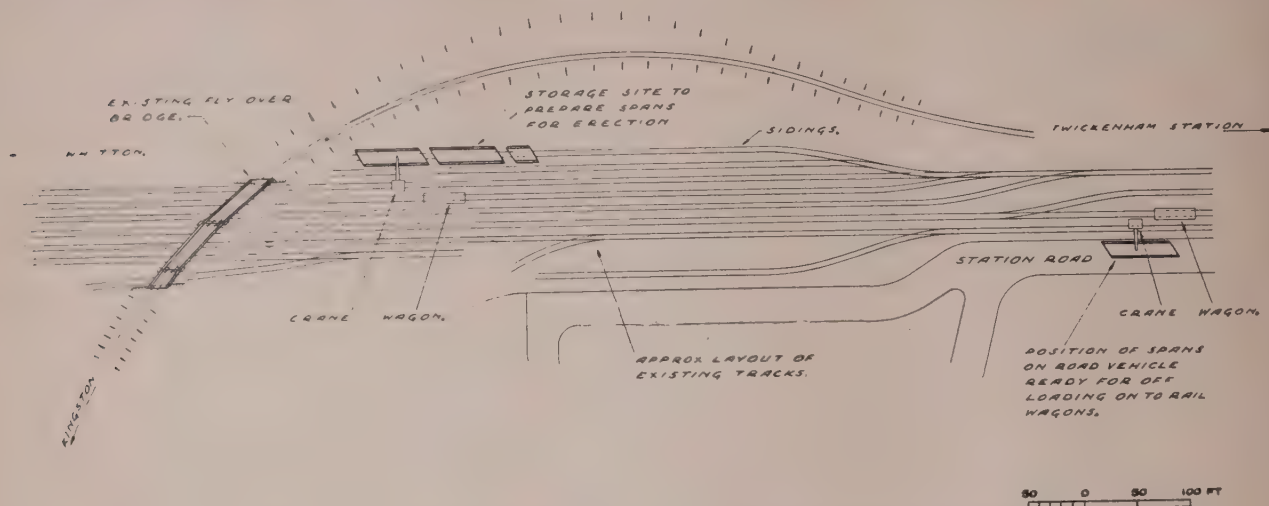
Twickenham Fly-over. Site plan showing existing bridge, off loading site for new spans and storage site
